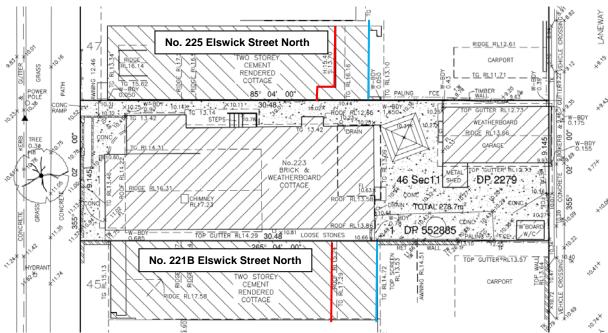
Existing pattern of development. The blue lines indicate ground floor BLZ and red lines indicate first floor rear BLZ.
